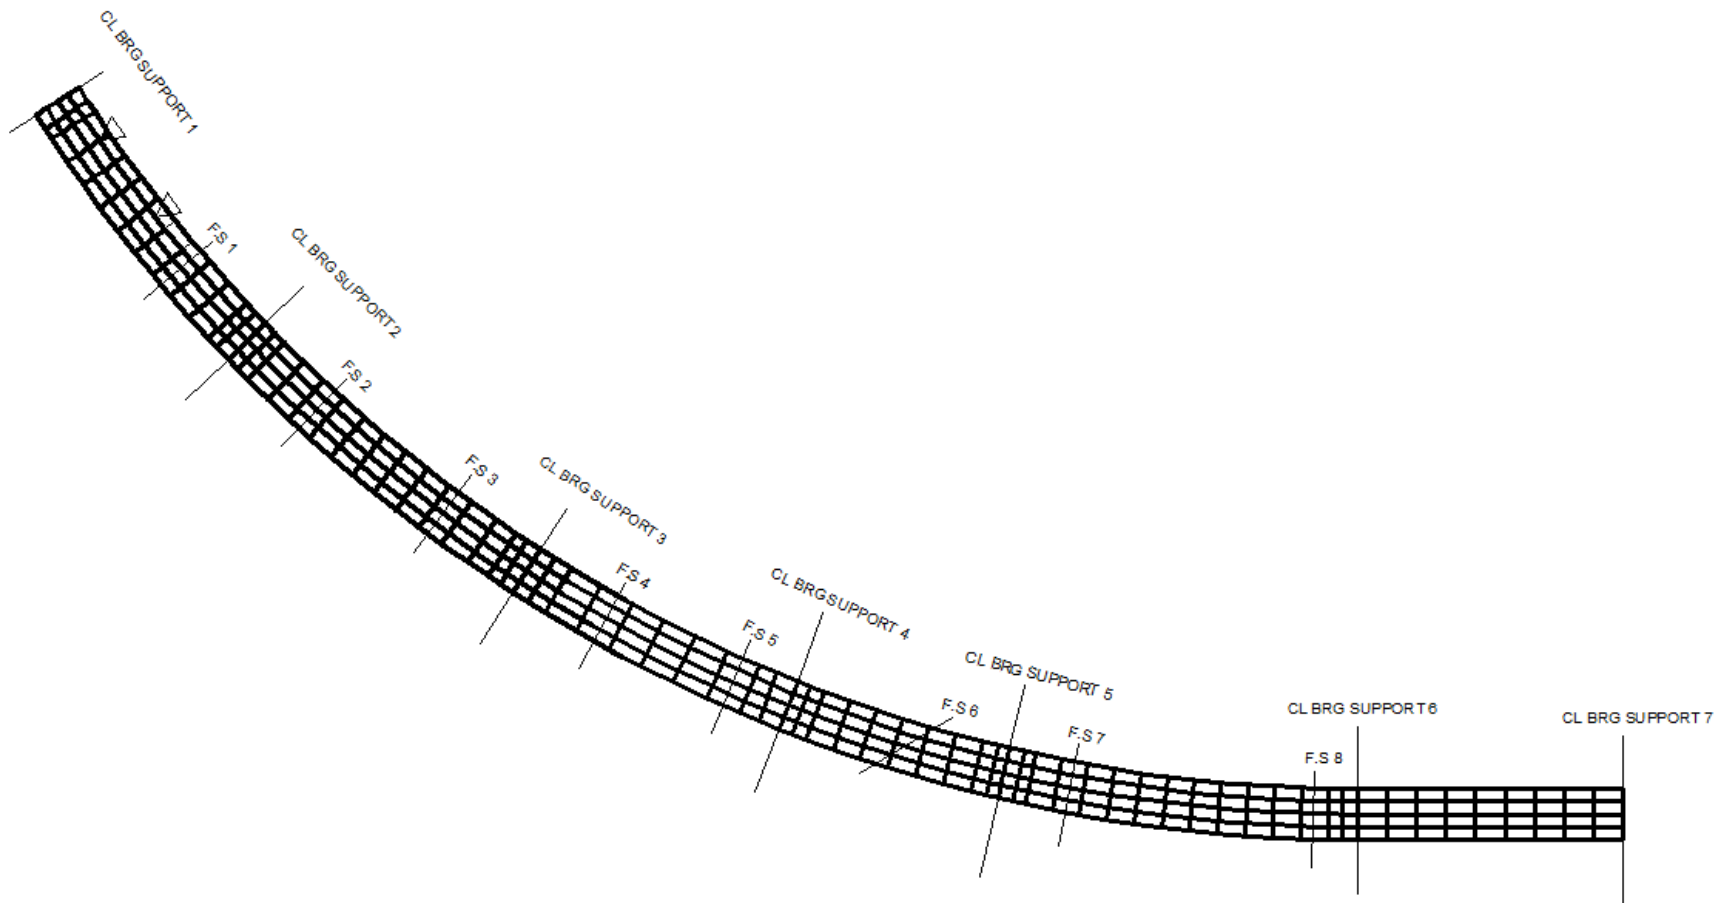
Critical erection stage of Bridge (G) EICCR4 for TDLF detailing (see Span 1). The darker lines show portions of the bridge that are already completed. The two triangles denote the pick points of the lifting crane.
